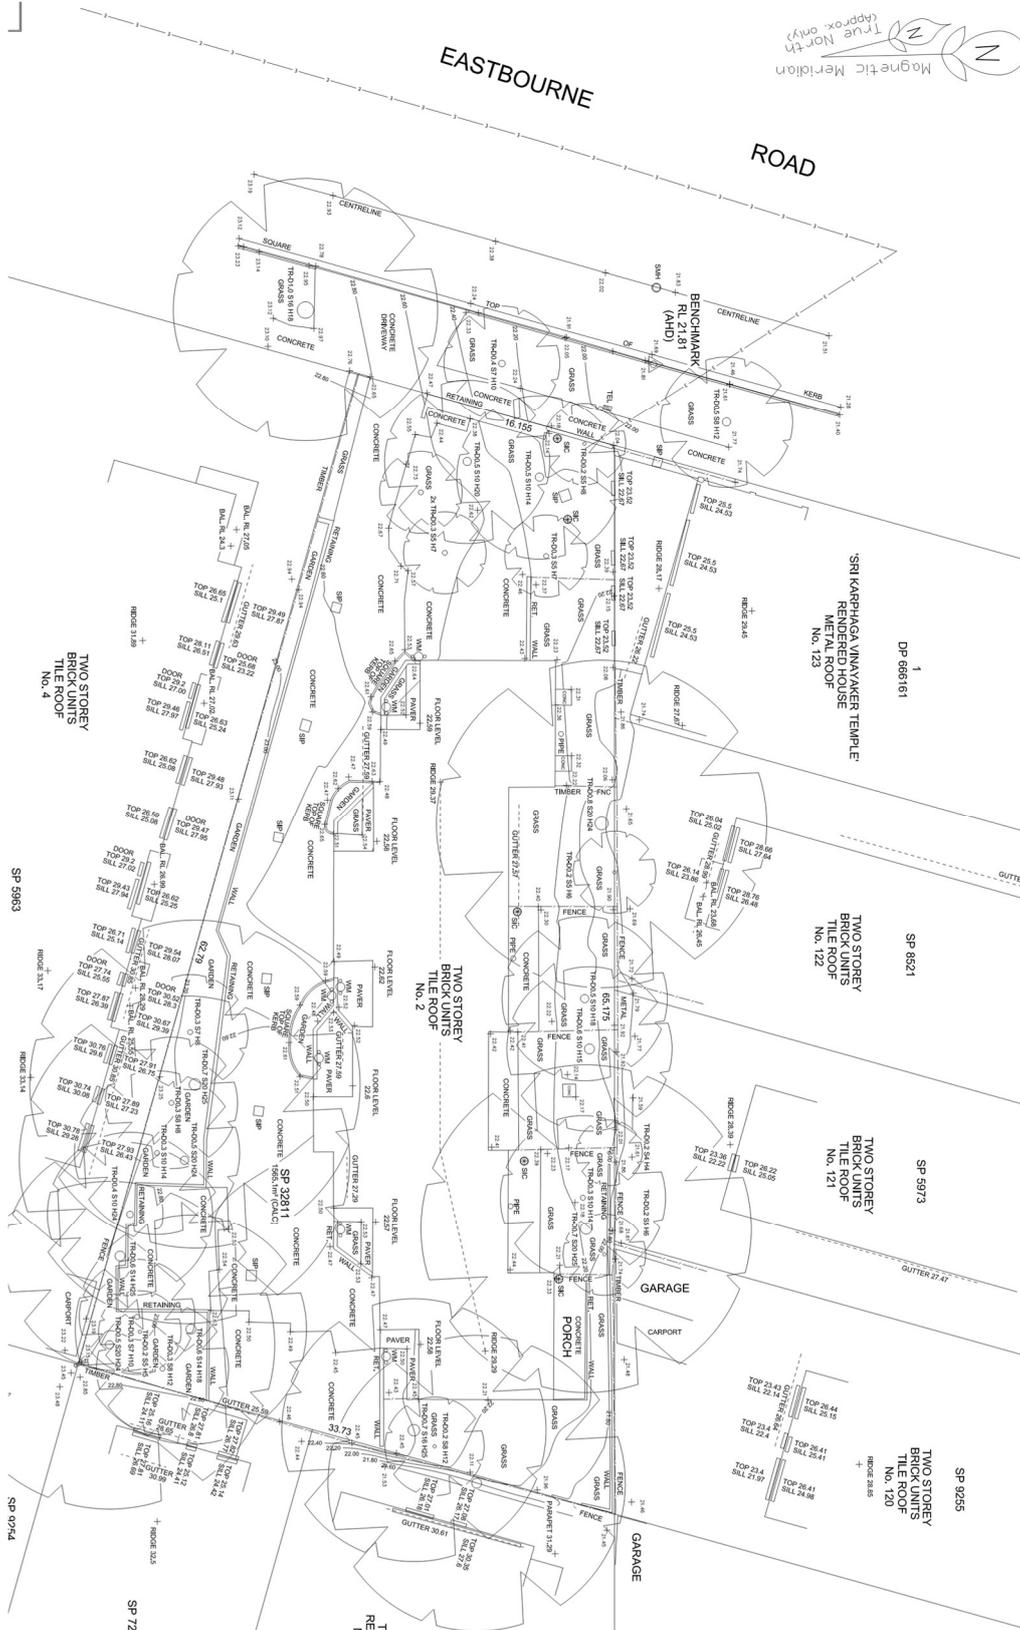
Pre-Developed Site Plan (Source: Plans by CC Surveying dated 11/12/19)
